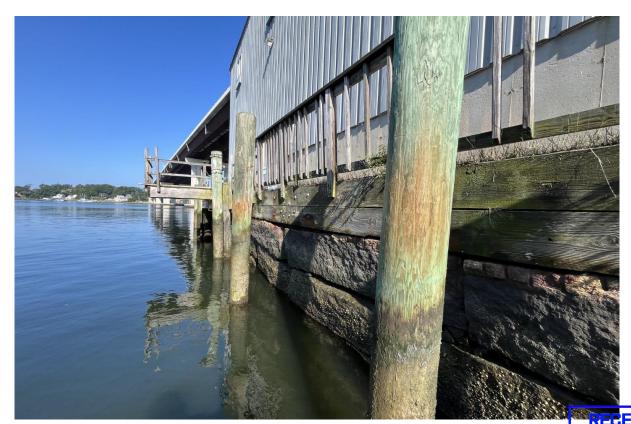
View of existing timber and concrete walkway to be replaced, adjacent to buildir g.
